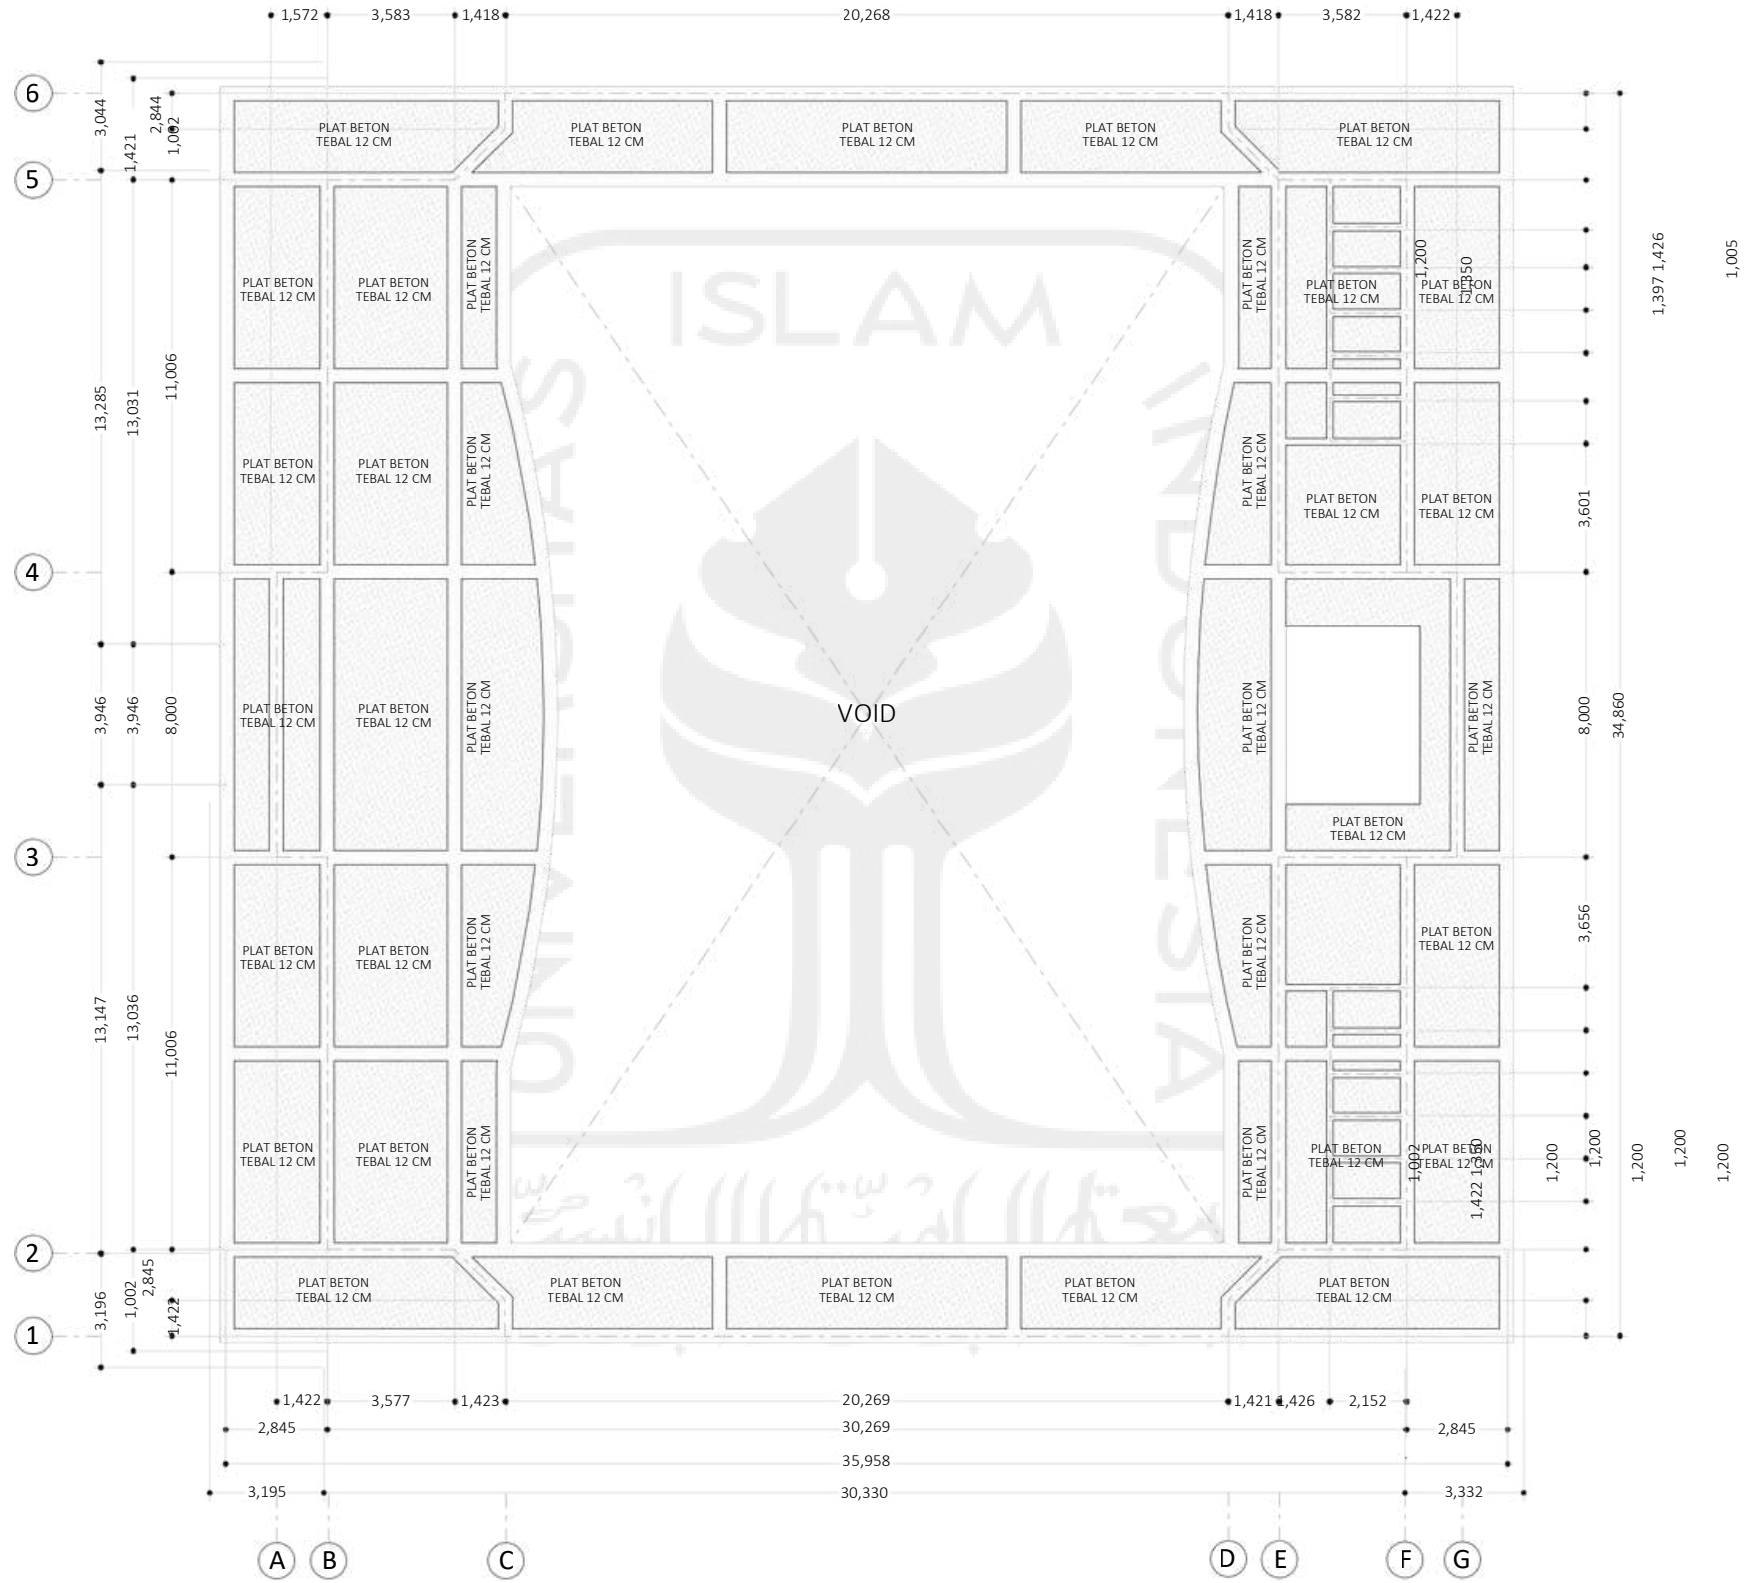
ST FLOORS (BUILDING A2)
